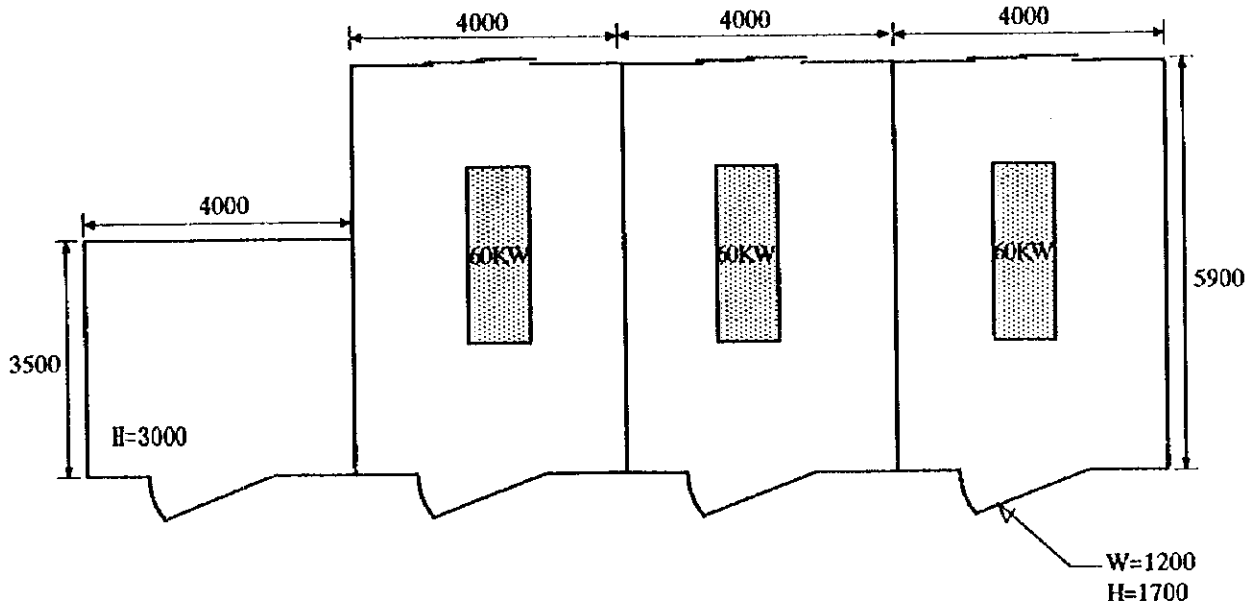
40 Layout Drawing of Tsagaan-Ovoo
